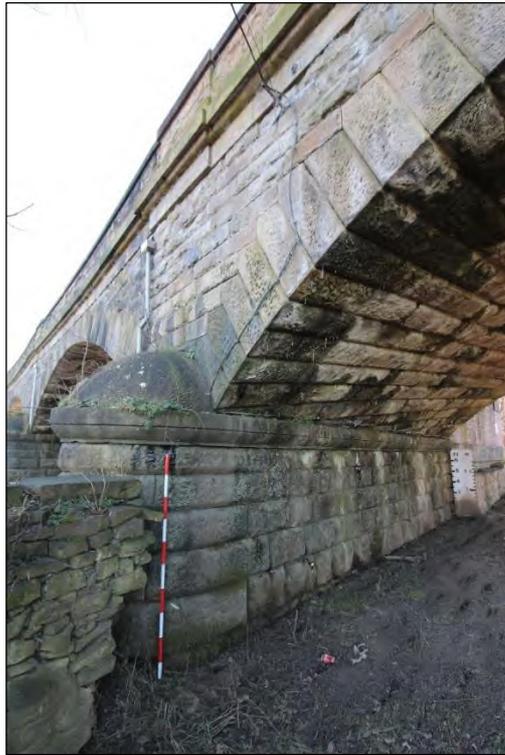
Northern elevation, span 5, showing rubble boundary wall against viaduct pier, 2m scale
